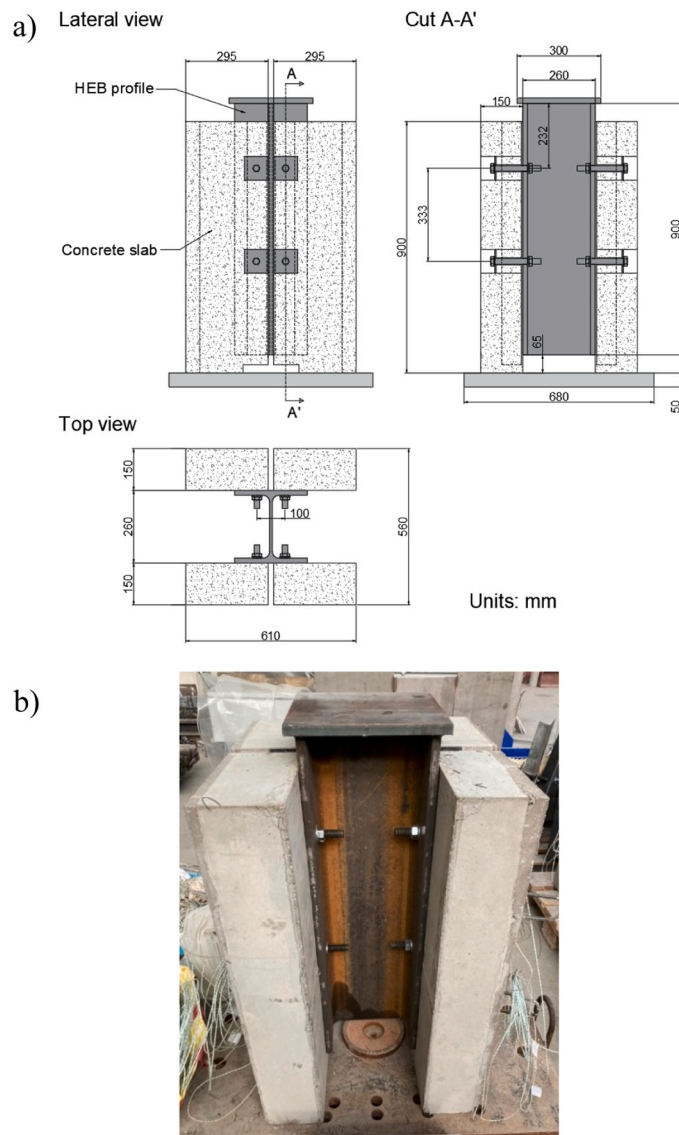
Push-out test specimens: a) schematic views and annotated dimensions; b) specimen ready for testing.
